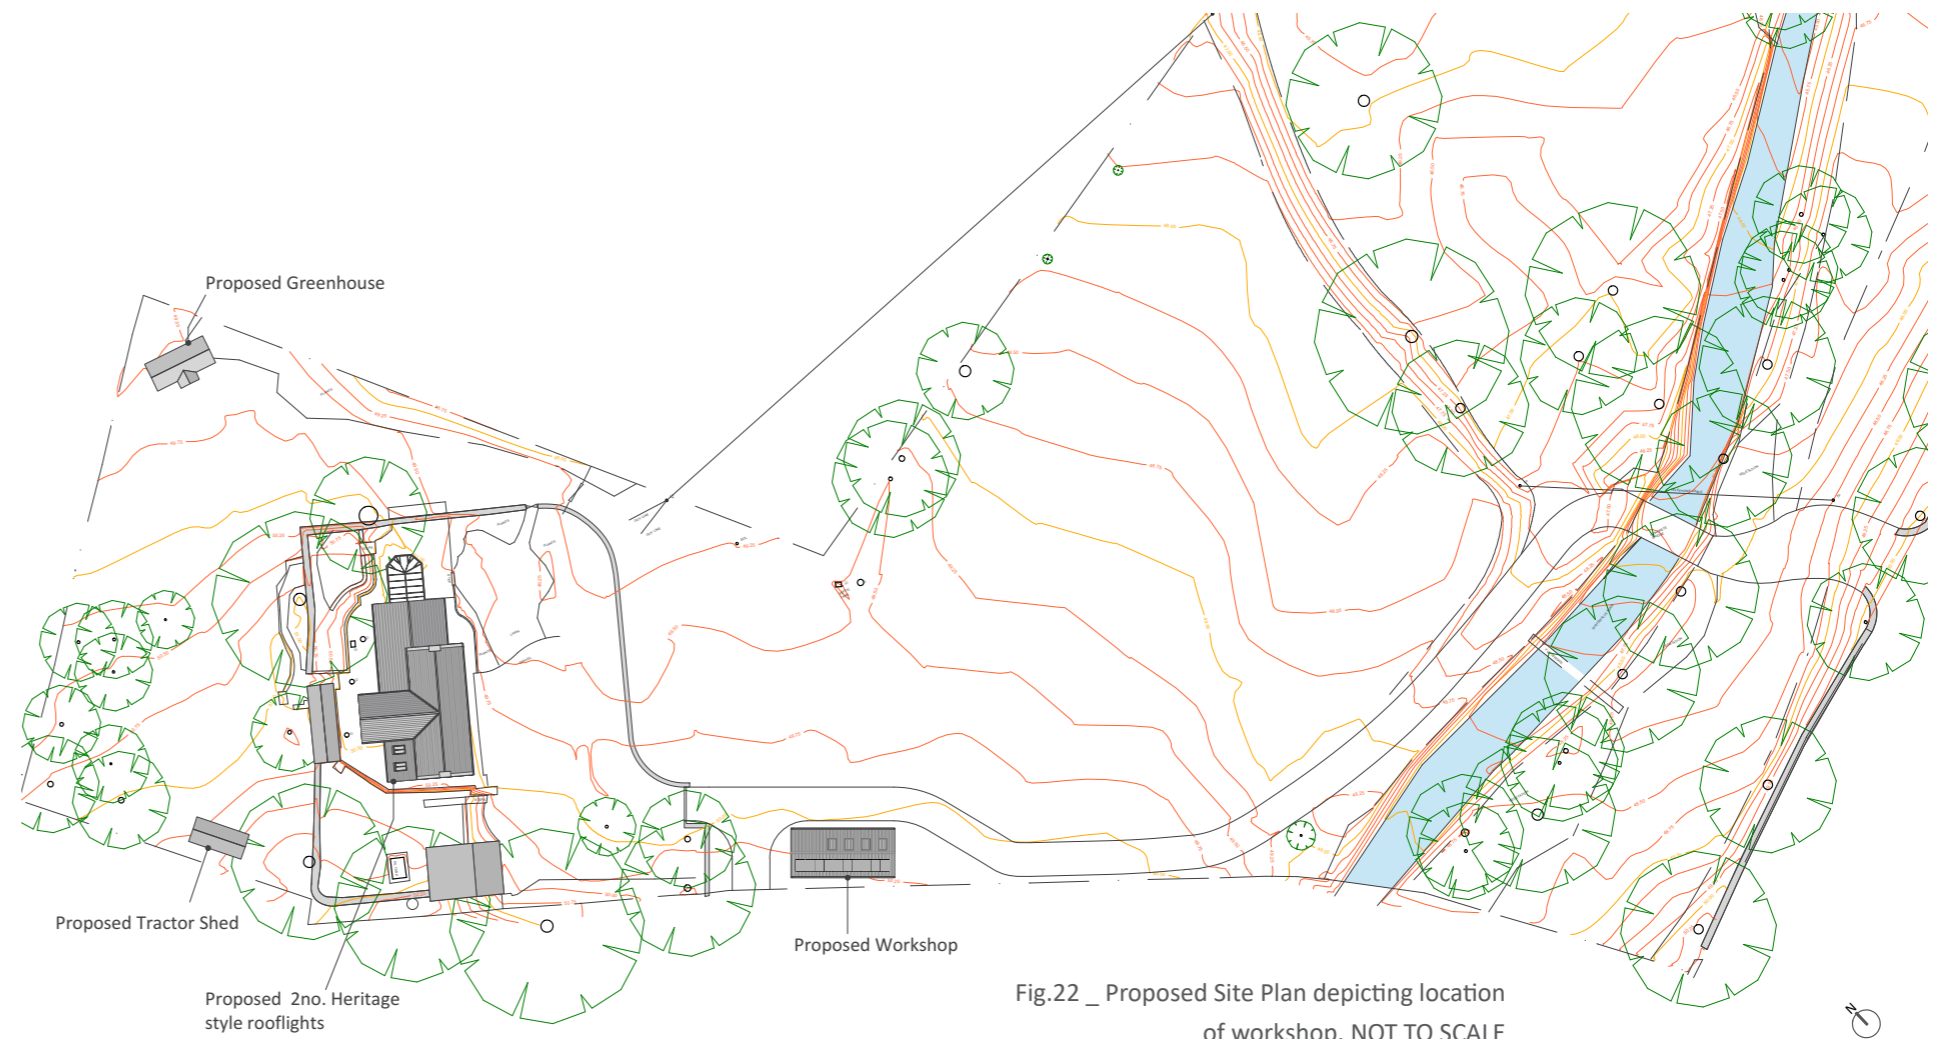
Proposed Site Plan depicting location of workshop. NOT TO SCALE
